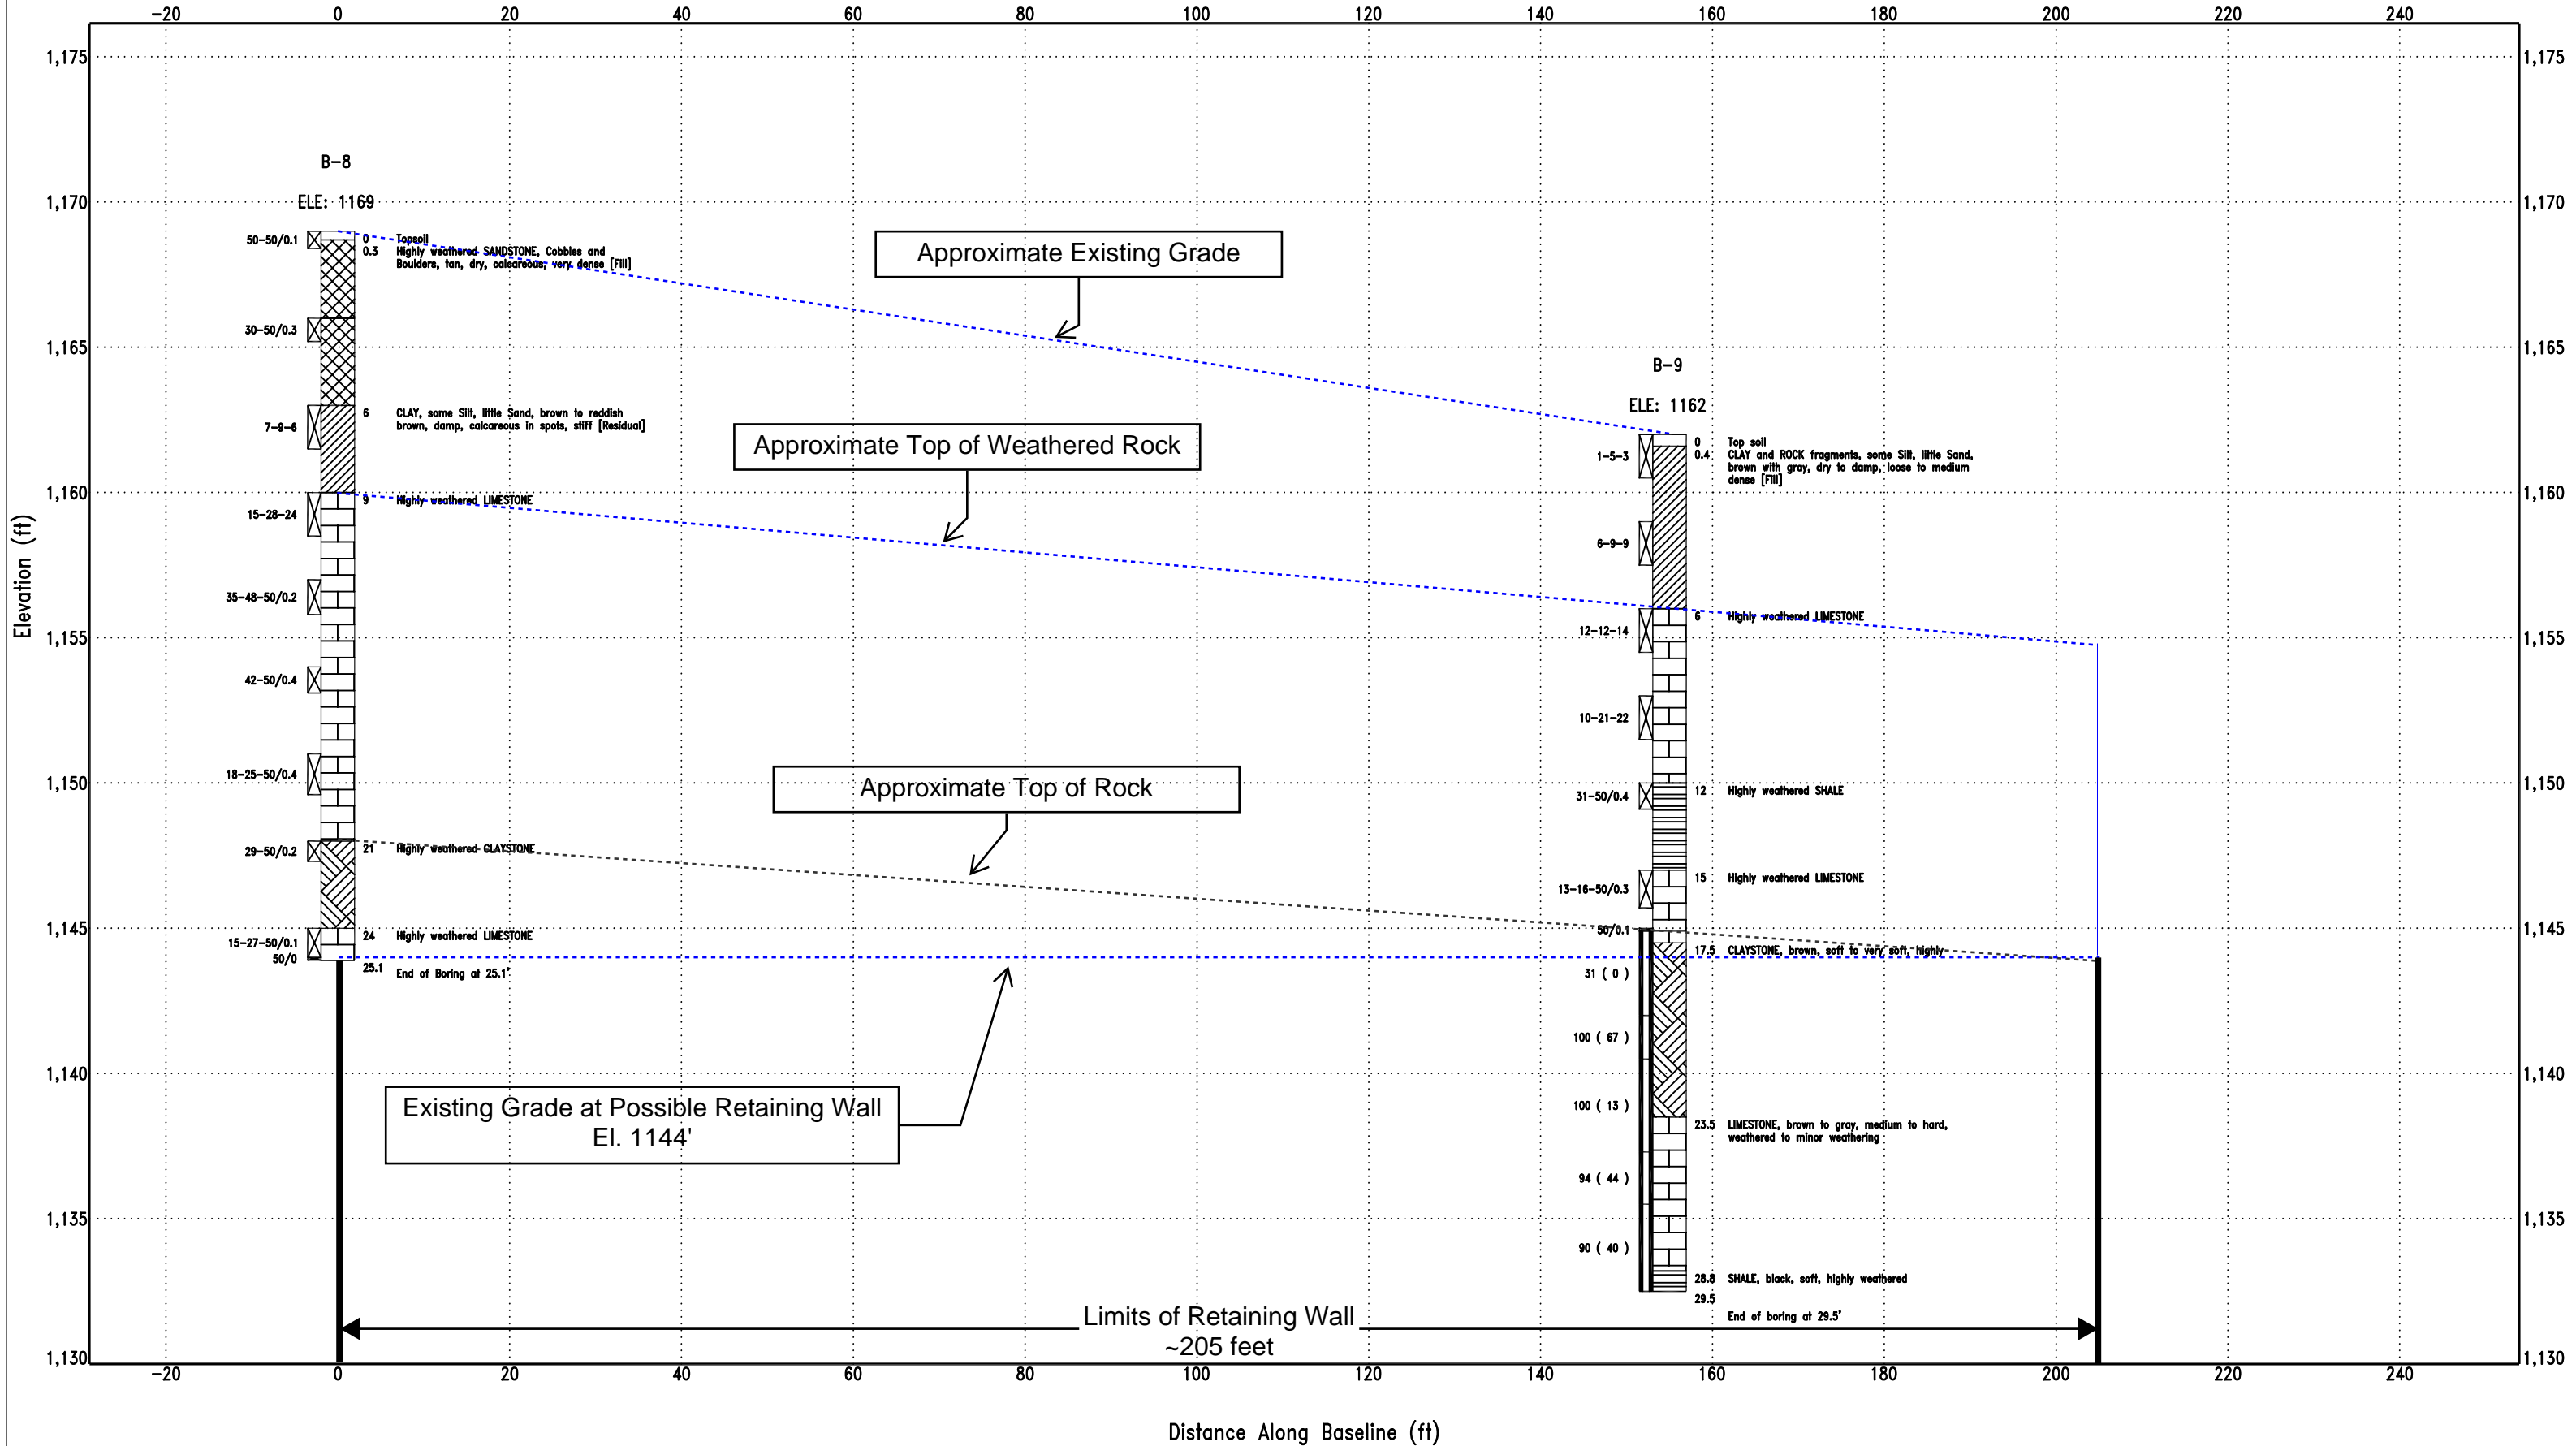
Preliminary Retaining Wall Subsurface Profile
